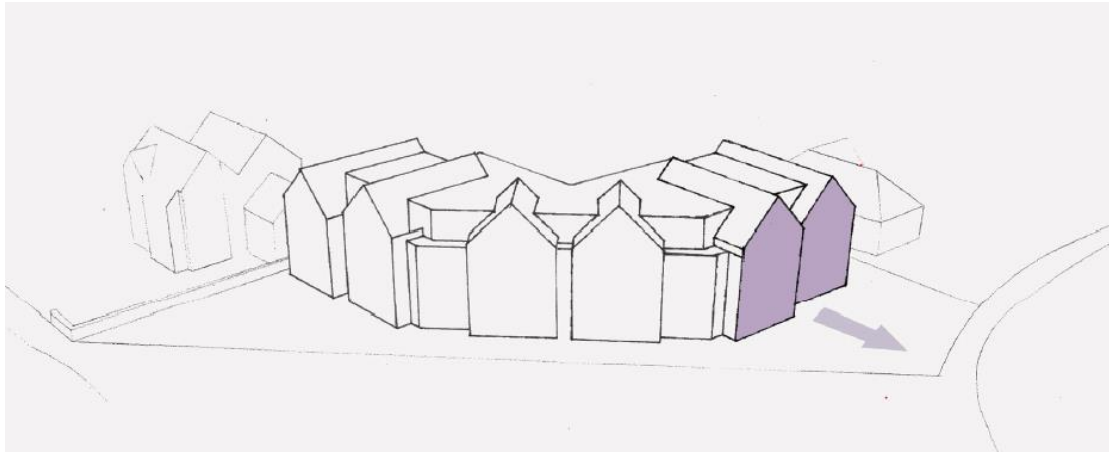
Proposed massing plan (area colour in purple facing Crofton Lane)
